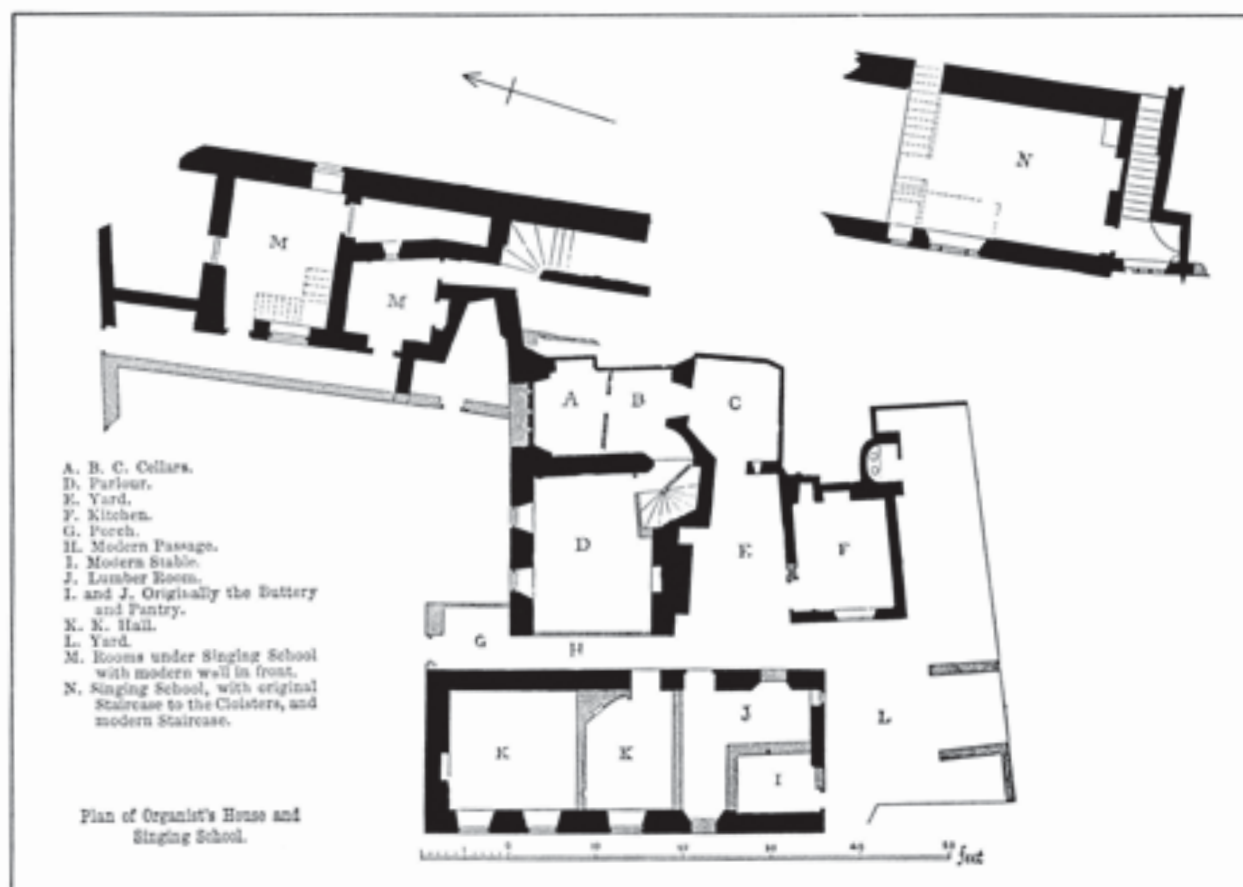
Plan of the choristers' house and adjacent claustral structures in c. 1865. After Parker 1866a
